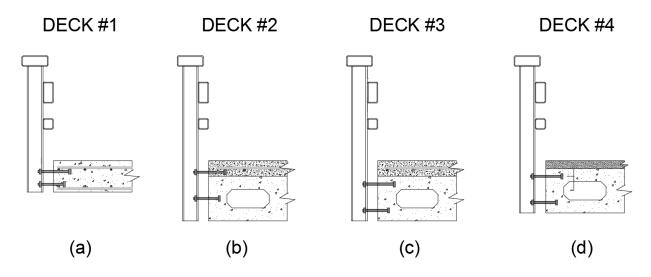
Four Bridge Deck Configurations with Post Attachment: (a) Reinforced Concrete Slab; (b) Pre-Stressed Box with a Reinforced Concrete Slab on Top; (c) Pre-Stressed Box with a Reinforced Concrete Slab on Top; and (d) Pre-Stressed Box with a 2-in. Asphalt Wearing Surface
